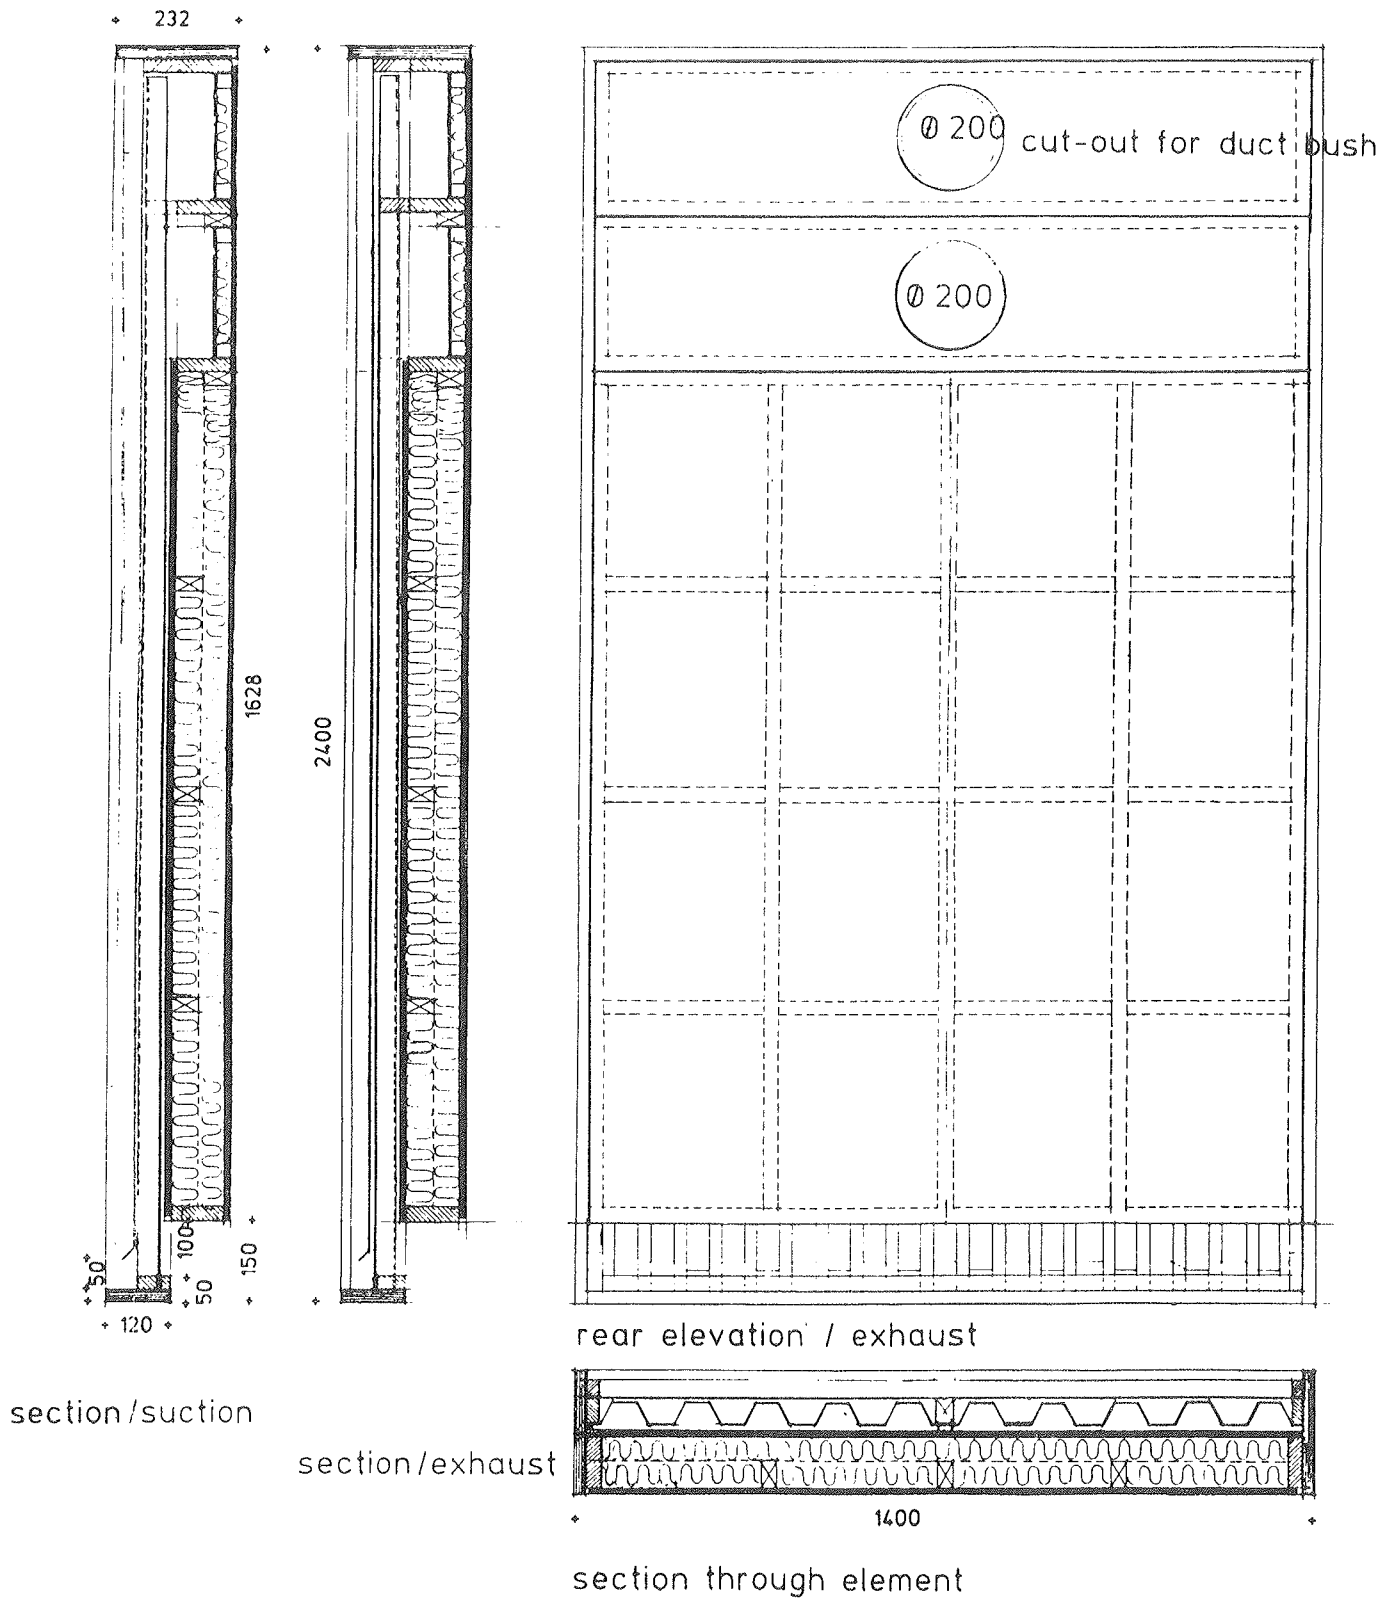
Drawings of the prototype of the MF-panel used for the project.
